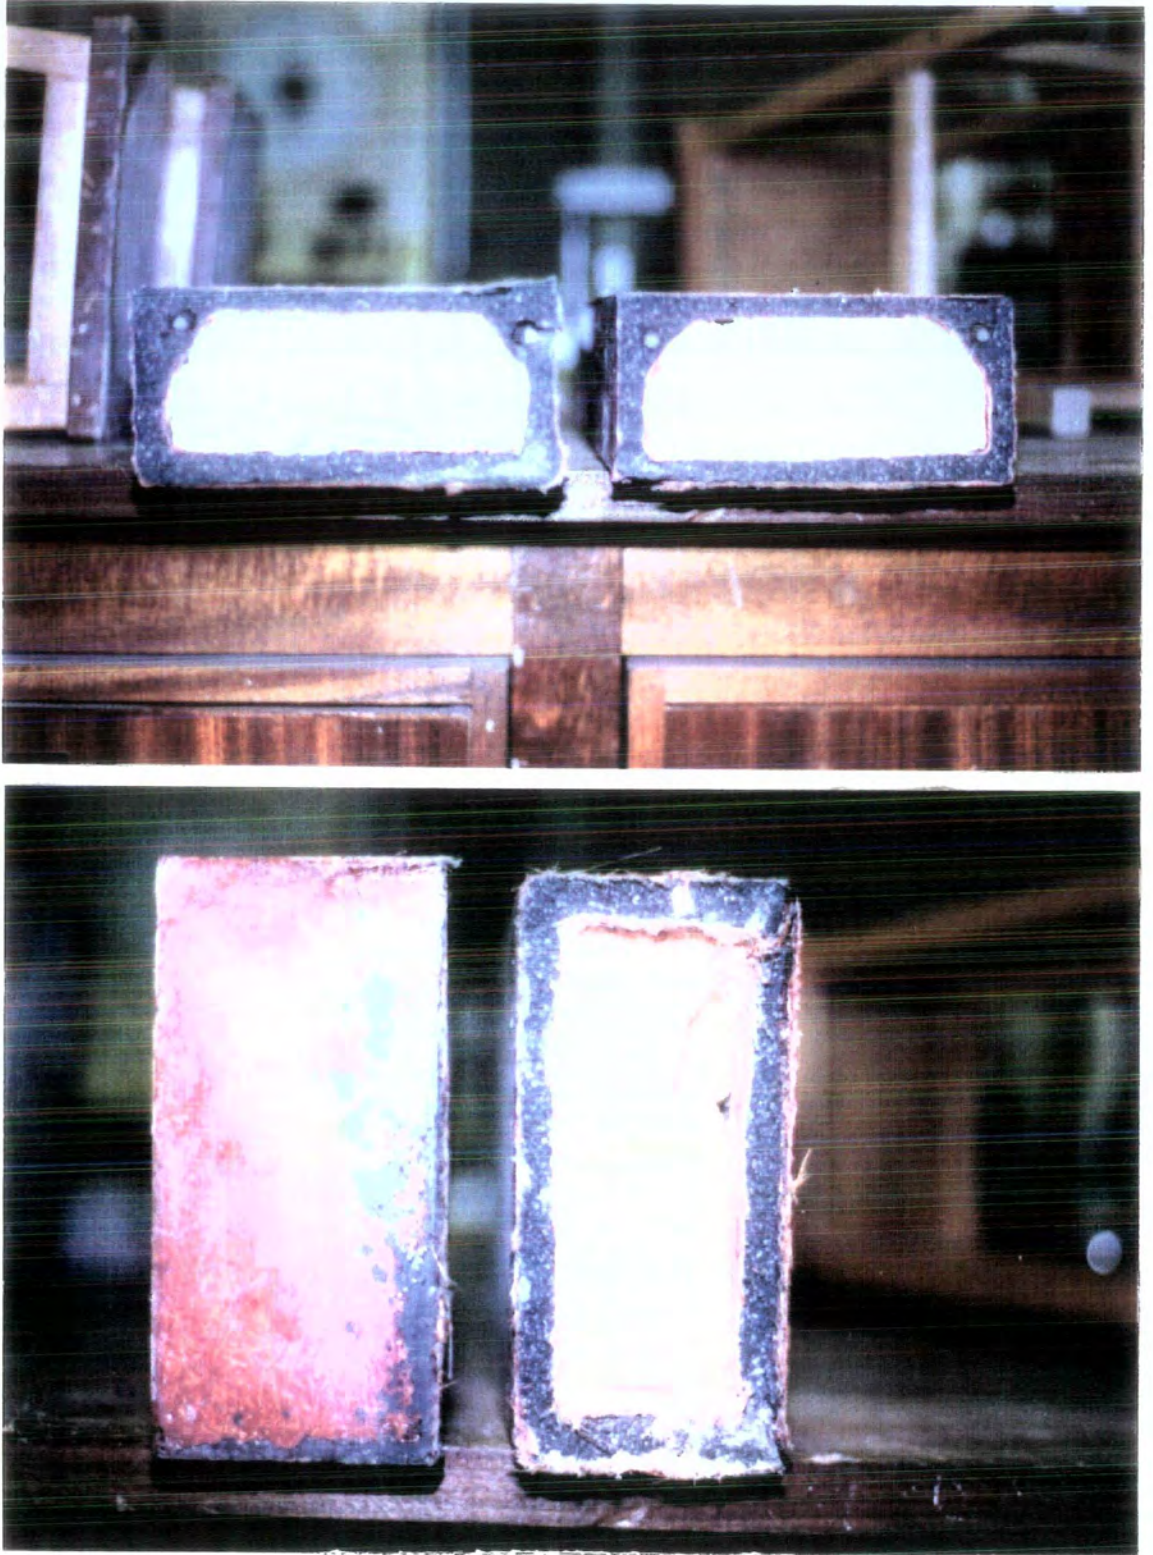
Cross section of the box beams after failure at the plane of failure.
